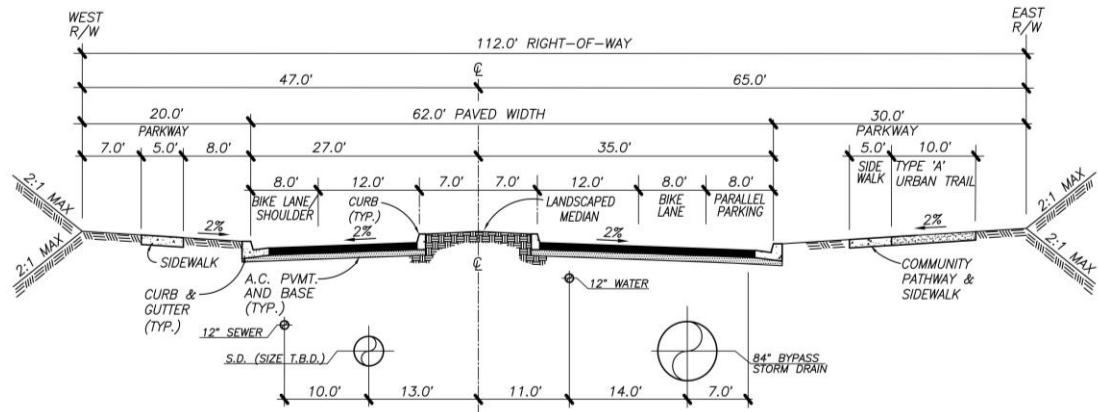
Street Section 3 - Proctor Valley Road
